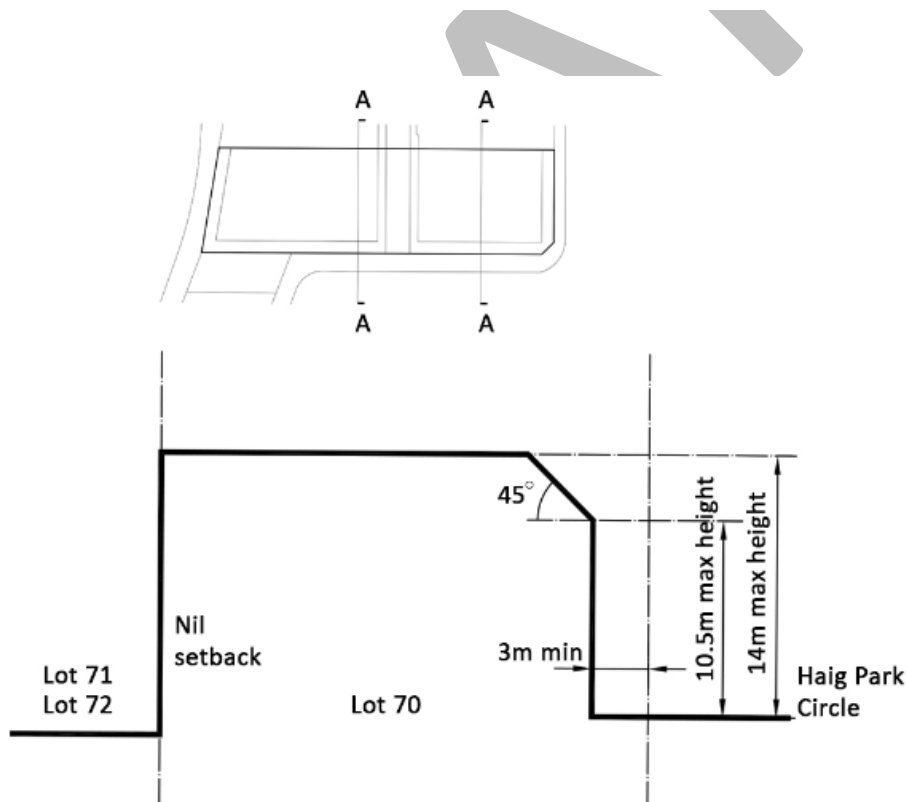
Section AA - North south section of building envelopes through eastern and western buildings.
